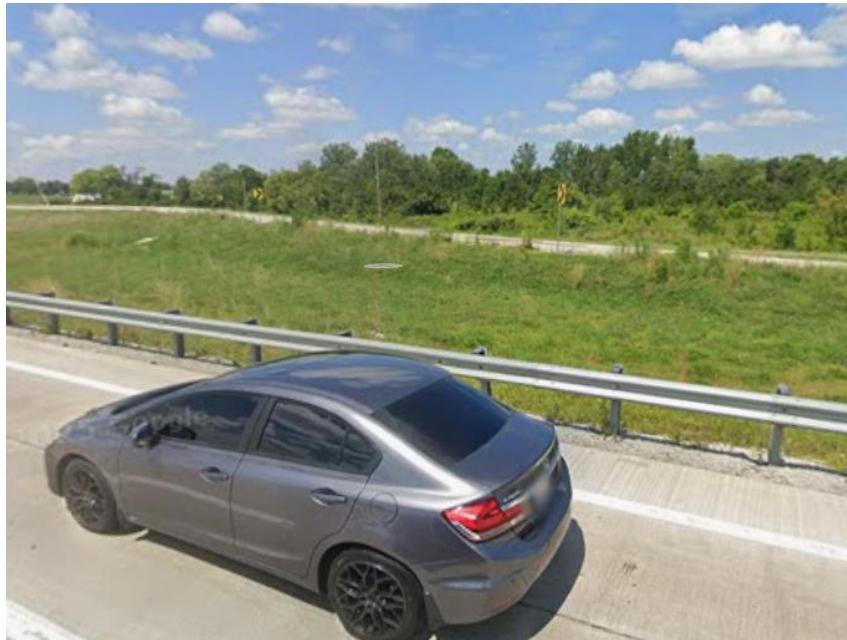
Subject Area Viewed from South (August 2025) – SB Traffic I-465
